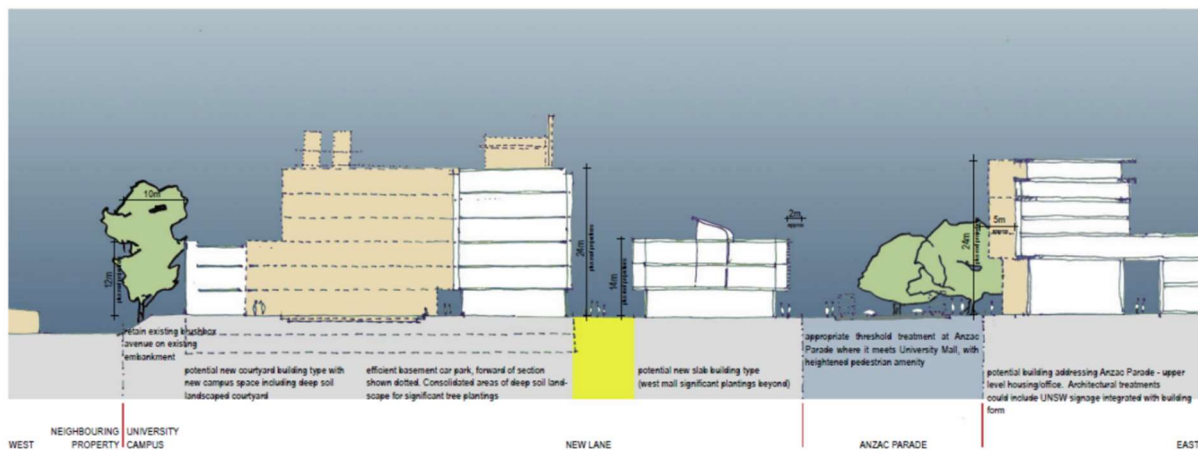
Cross Section 2-2 through Anzac Parade (Source: RDCP)
